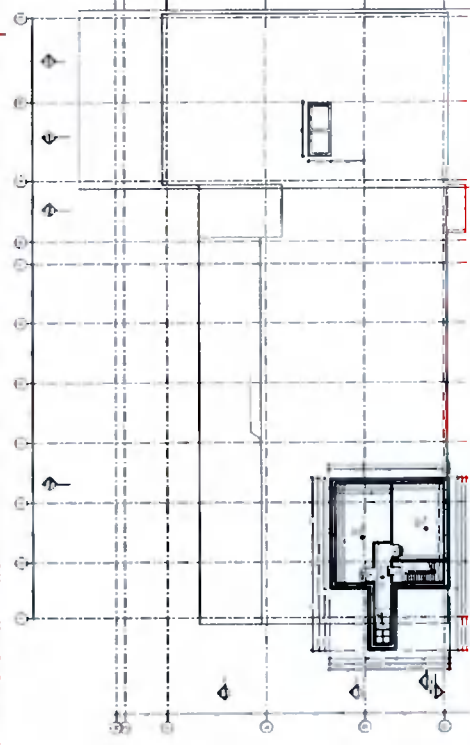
C.A.B. Proposed Basement Plan (image updated)
